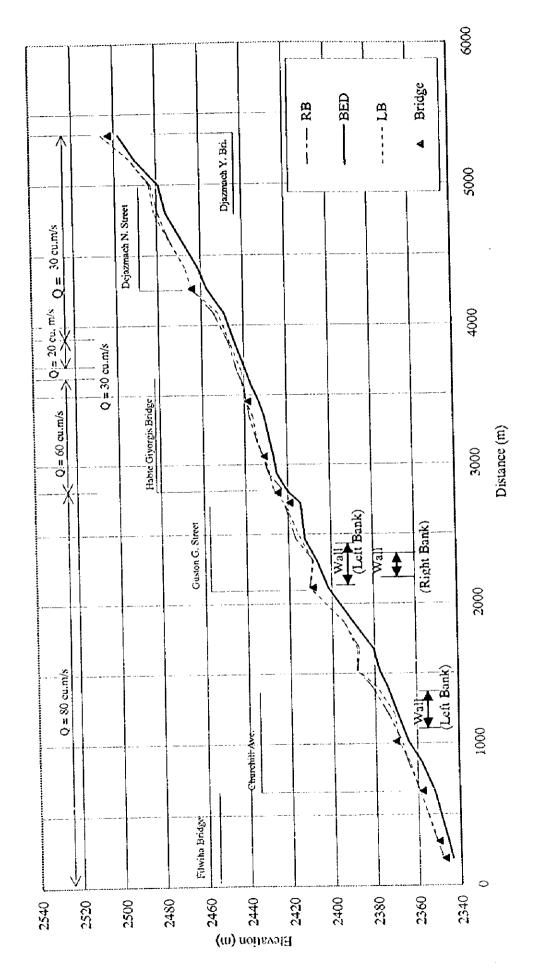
Proposed Plan of the Bantyiketu River(3/5)
